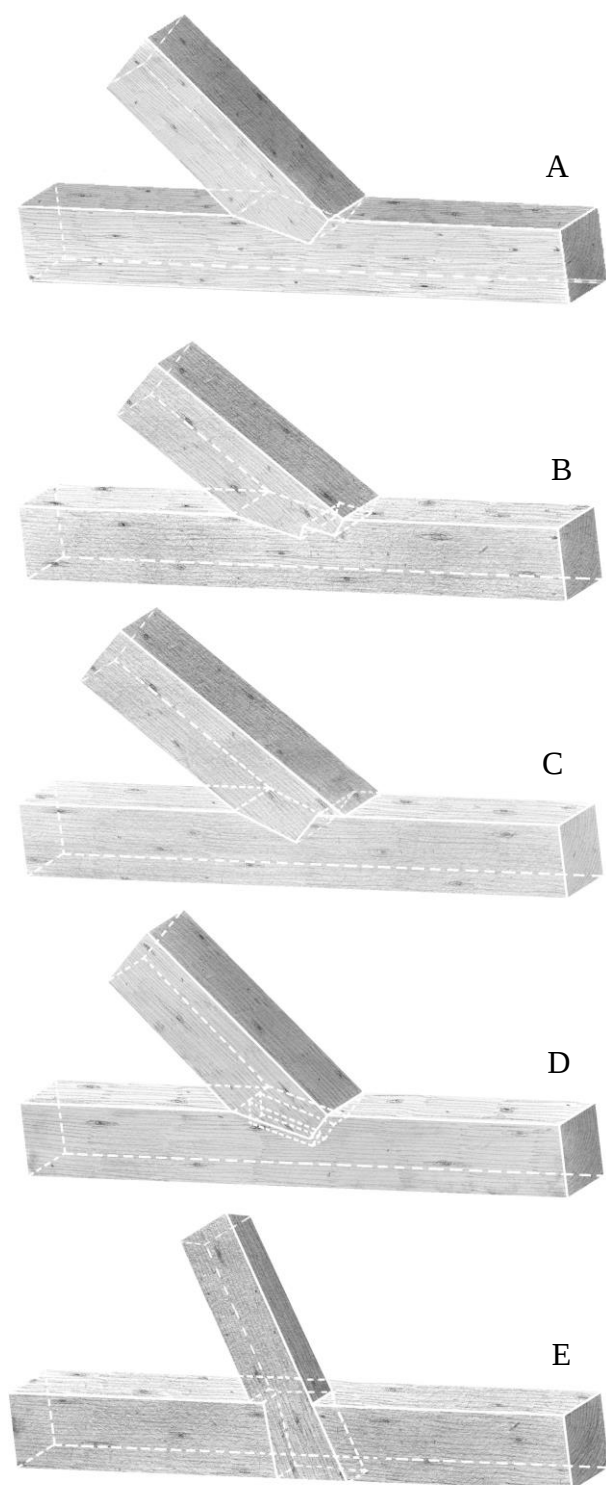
Examples of common roof truss connections, including (A) Single step joint, (B) Double step joint, (C) Reverse step joint, (D) Tapered-tenon step joint, and (E) Half dovetail mortise-tenon joint. Drawing by Eva Kévers-Leclercq.
